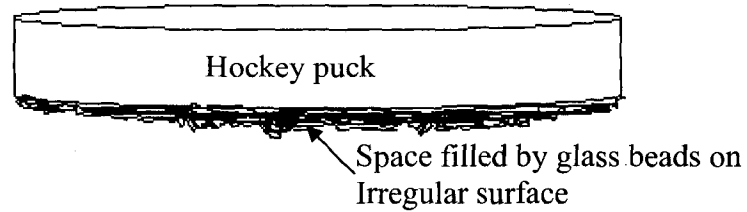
Side View of Pavement Surface after Sand Patch Test
